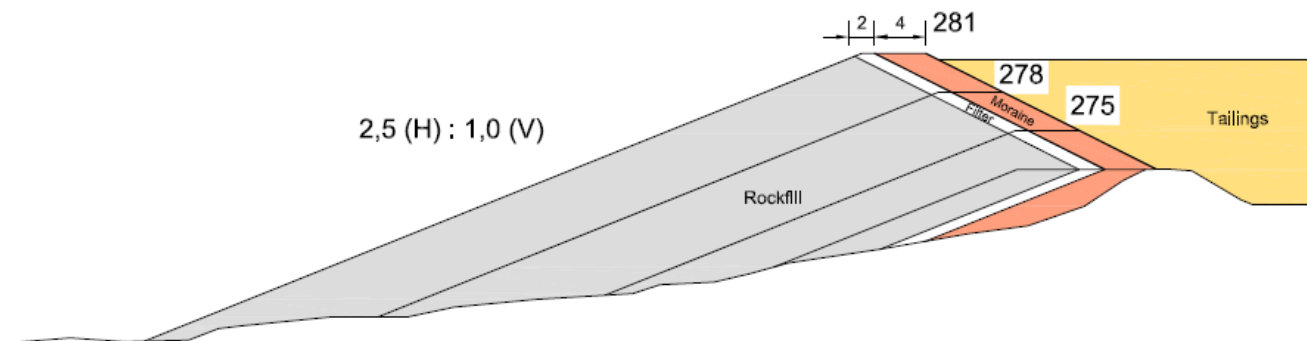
TSF NAG West Dam typical cross section (at existing Northwest dam location)
